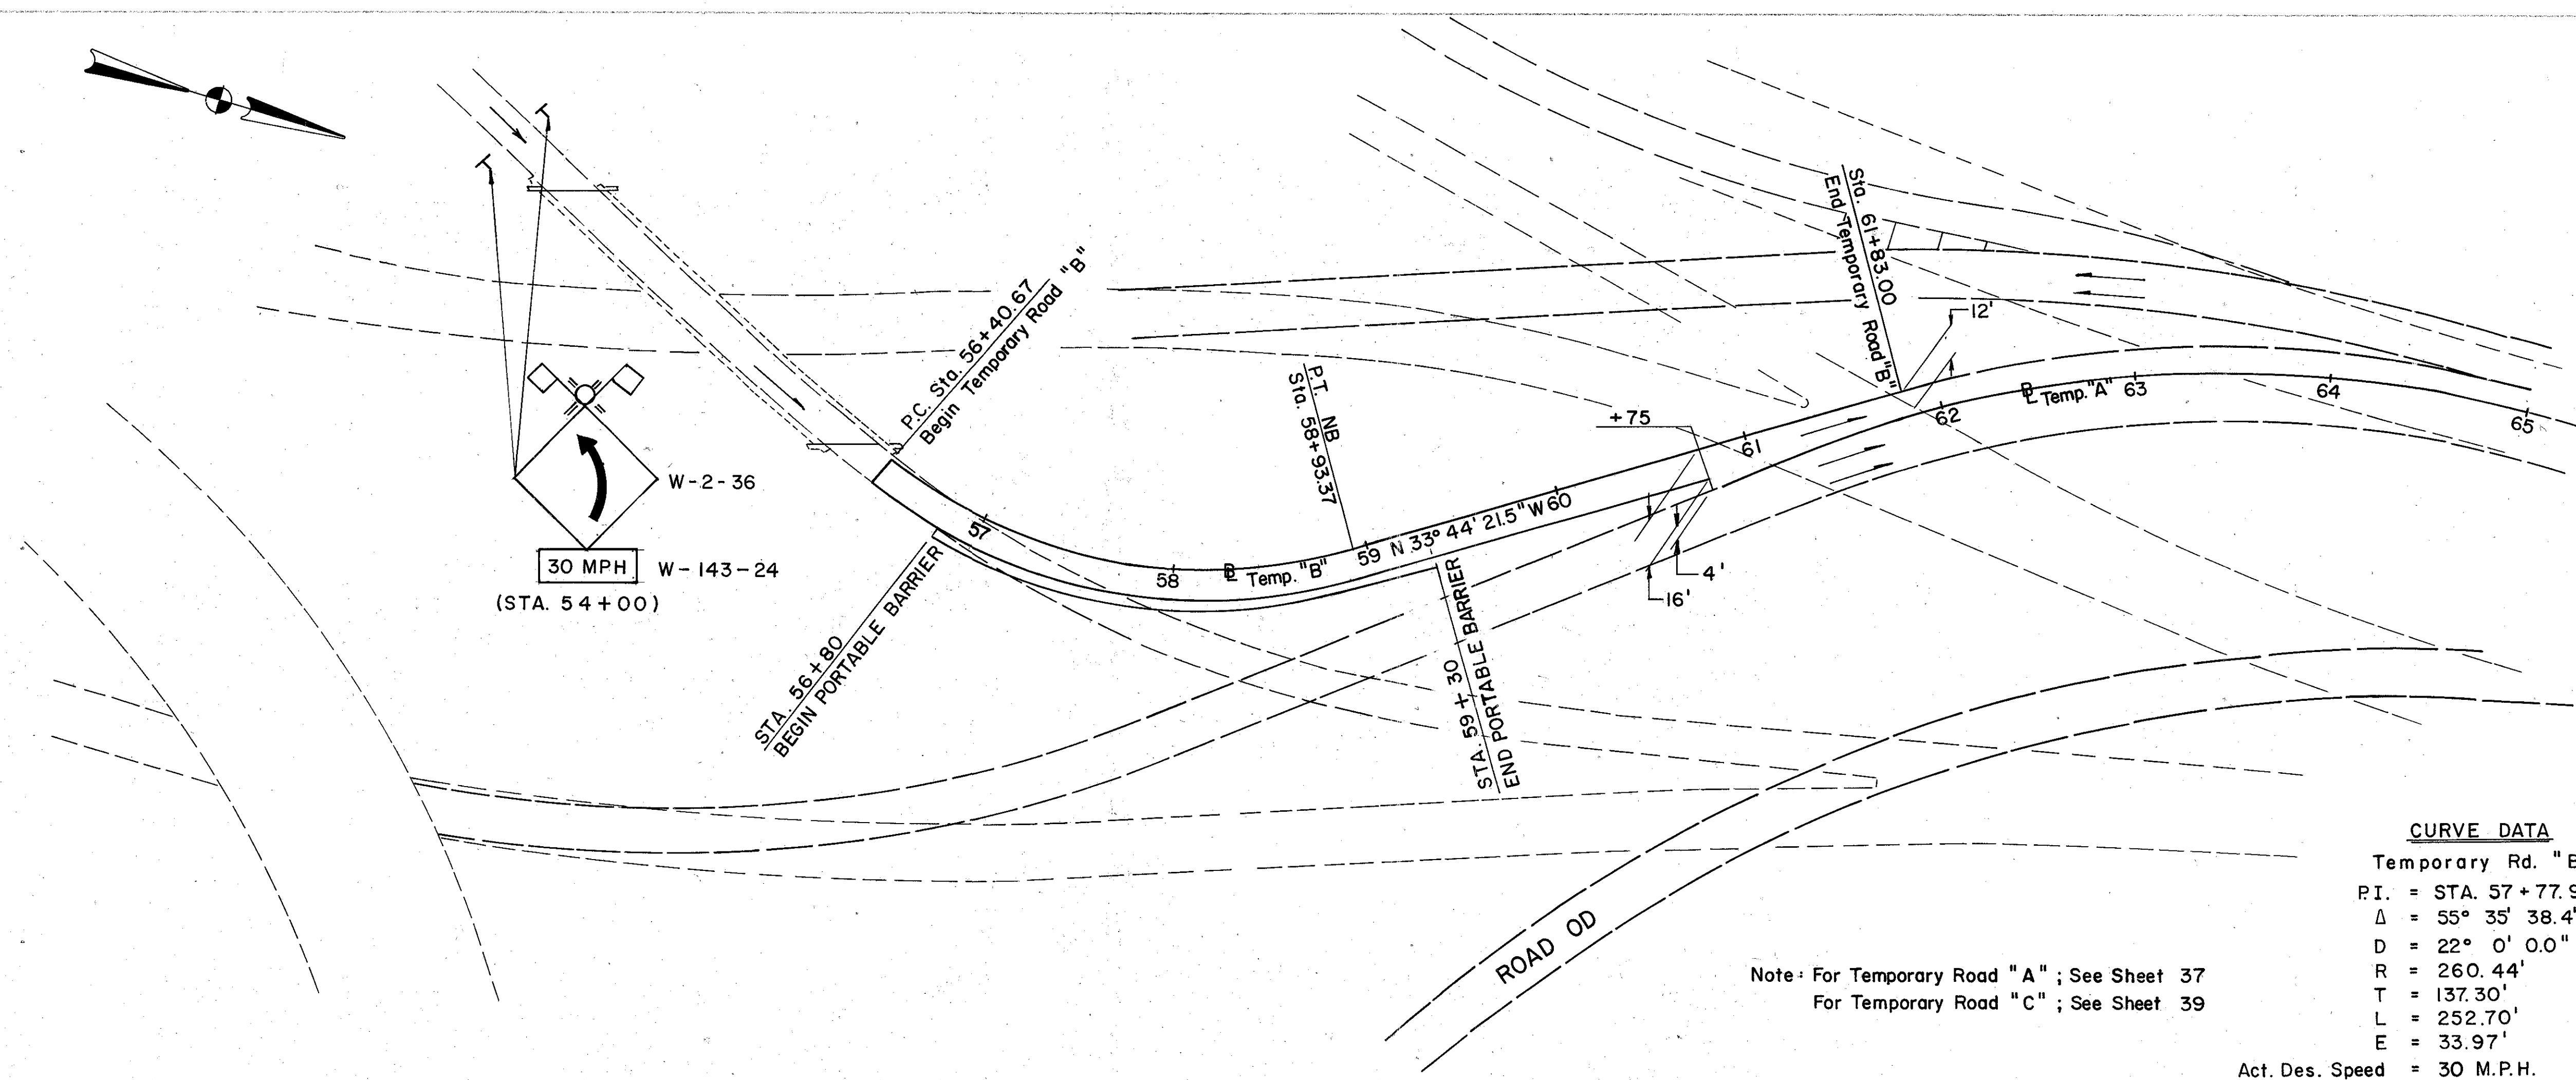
SINGLE PLAN AND CROSS SECTION FULL LINE
